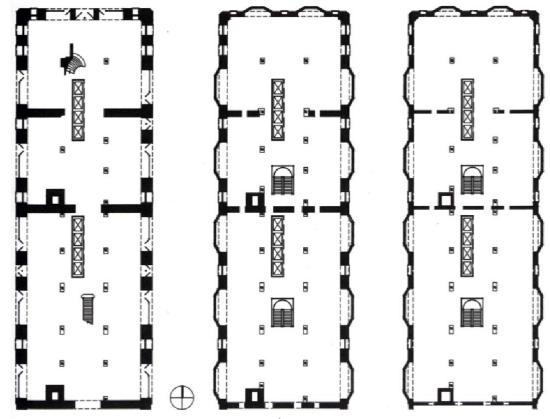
Floor Plans of the Monadnock Building <sup>3</sup>
